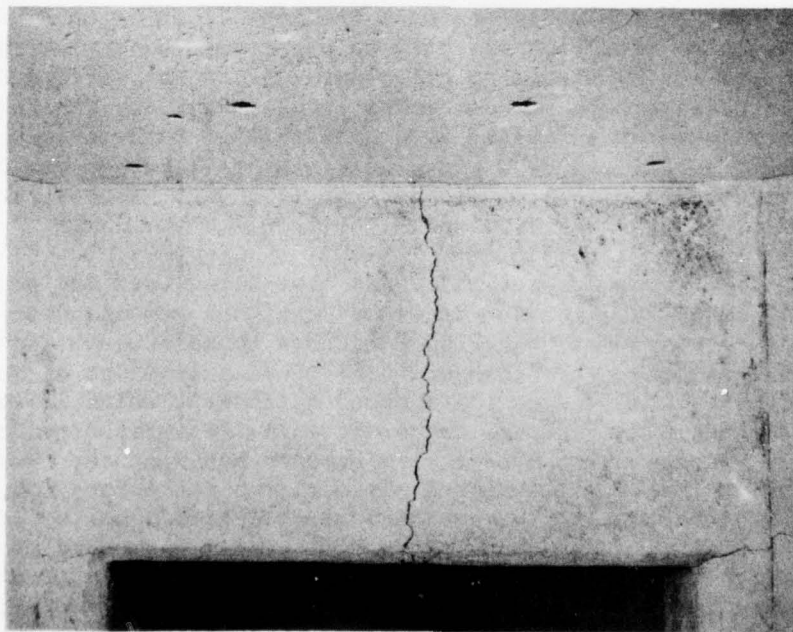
Cracking in Front Wall of Firebox After Curing
